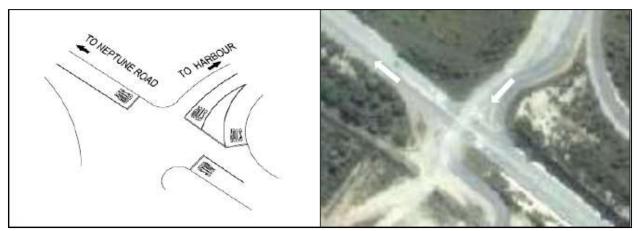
Geometric layout and aerial view of the intersection just before Neptune Road
